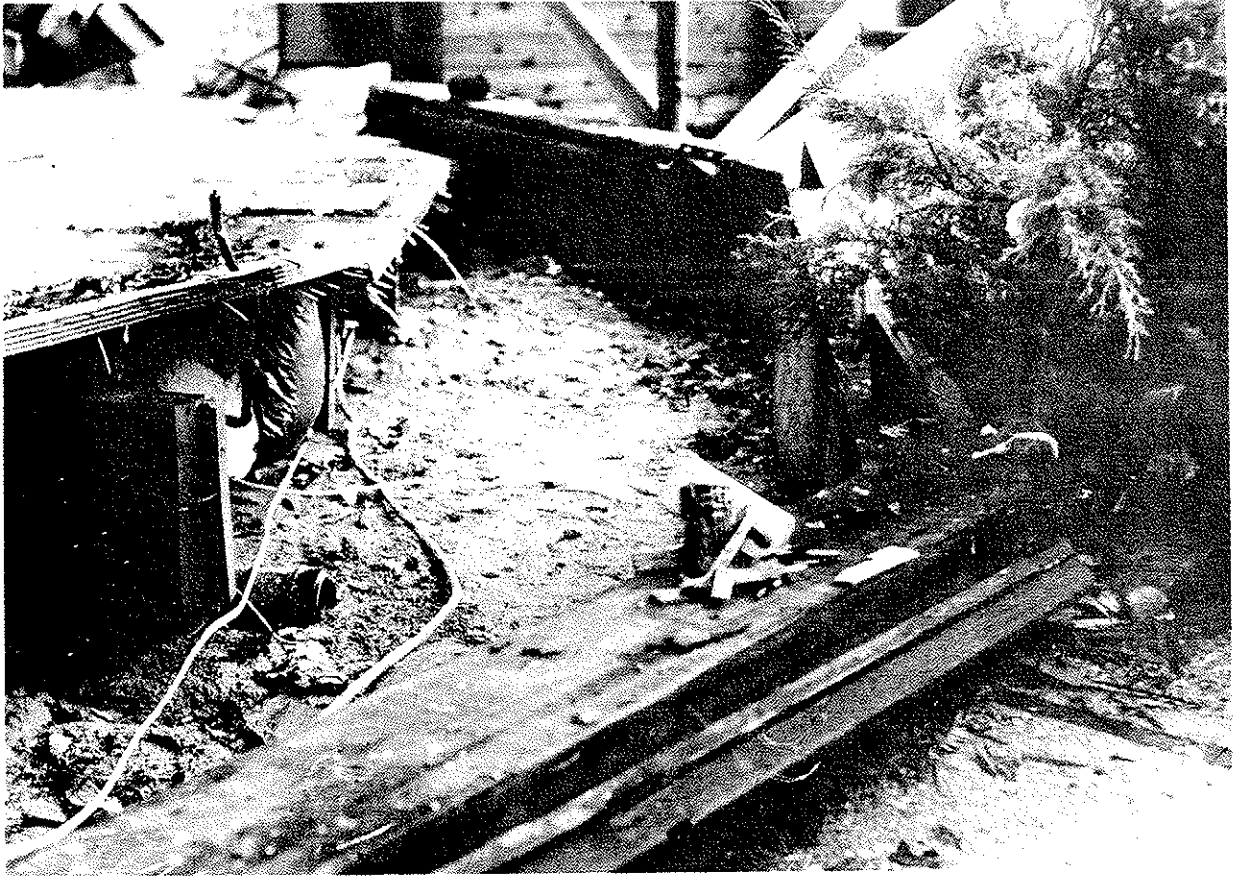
Completely destroyed house in Santa Cruz County. The lag screws connecting the band joist to the anchors failed in withdrawal. Other than a single toe nail, no fasteners were found tying the floor joists to the well anchored sill.
